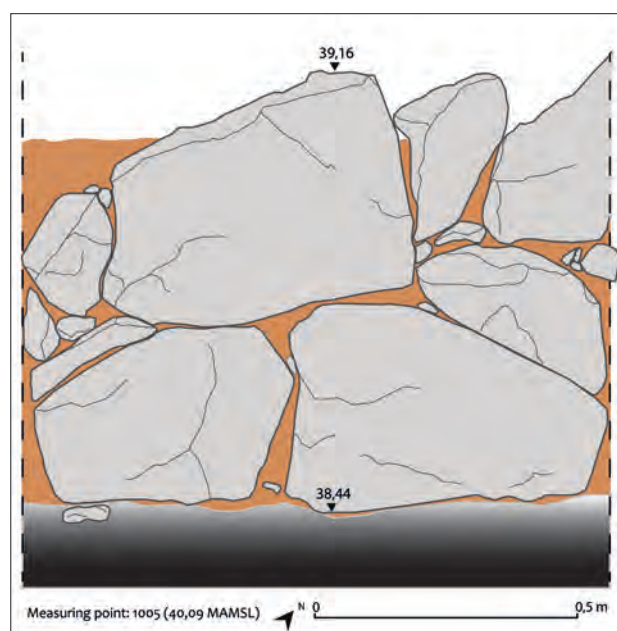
Drawing of a section of the southwestern façade of Wall A, by D. Marincola
